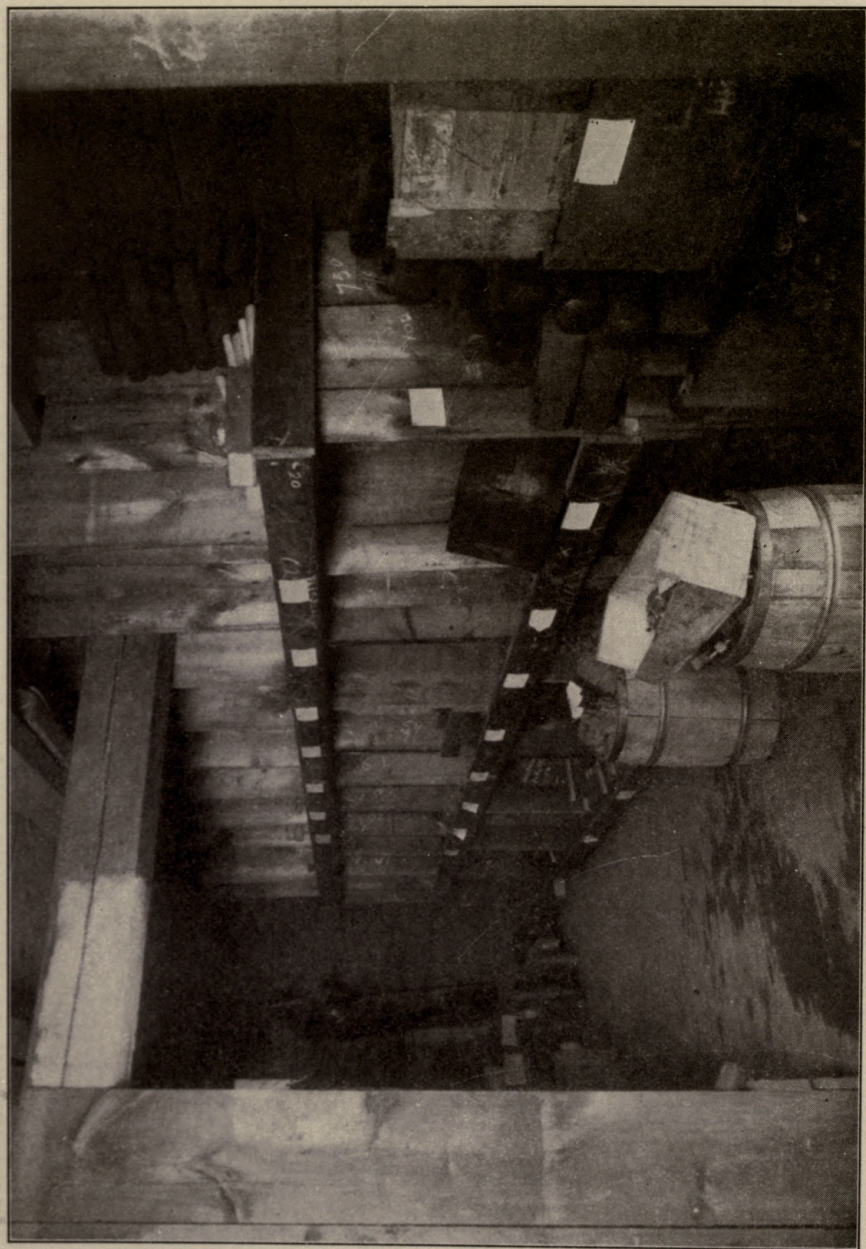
INTERIOR VIEW—OLD STOREHOUSE—24TH STREET YARD.
